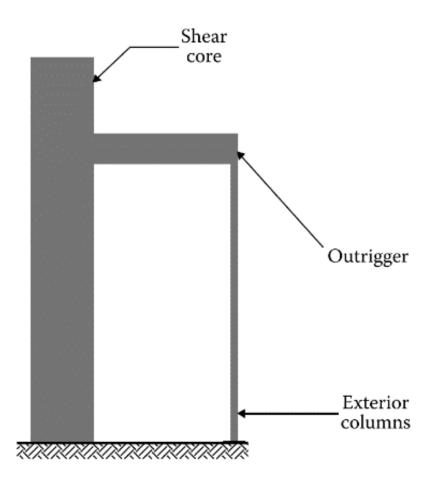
Outrigger and belt wall system with an offset core.
